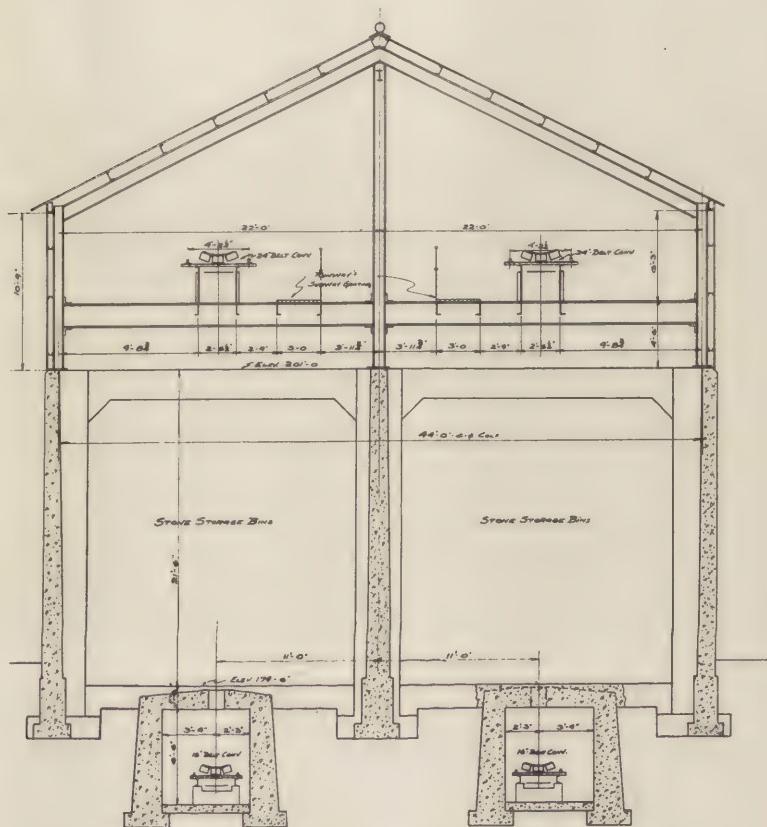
Reinforced concrete stone storage.—National Cement Co., Montreal, Can.
